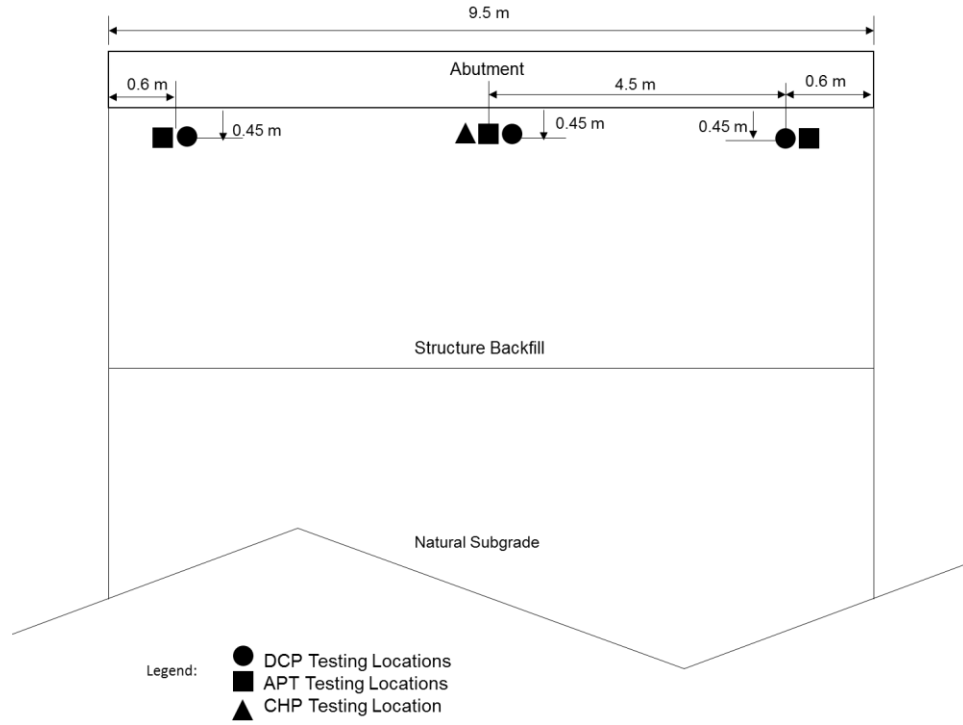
Plan view of the bridge abutment showing APT and DCP test locations at Hobbles Creek Bridge
